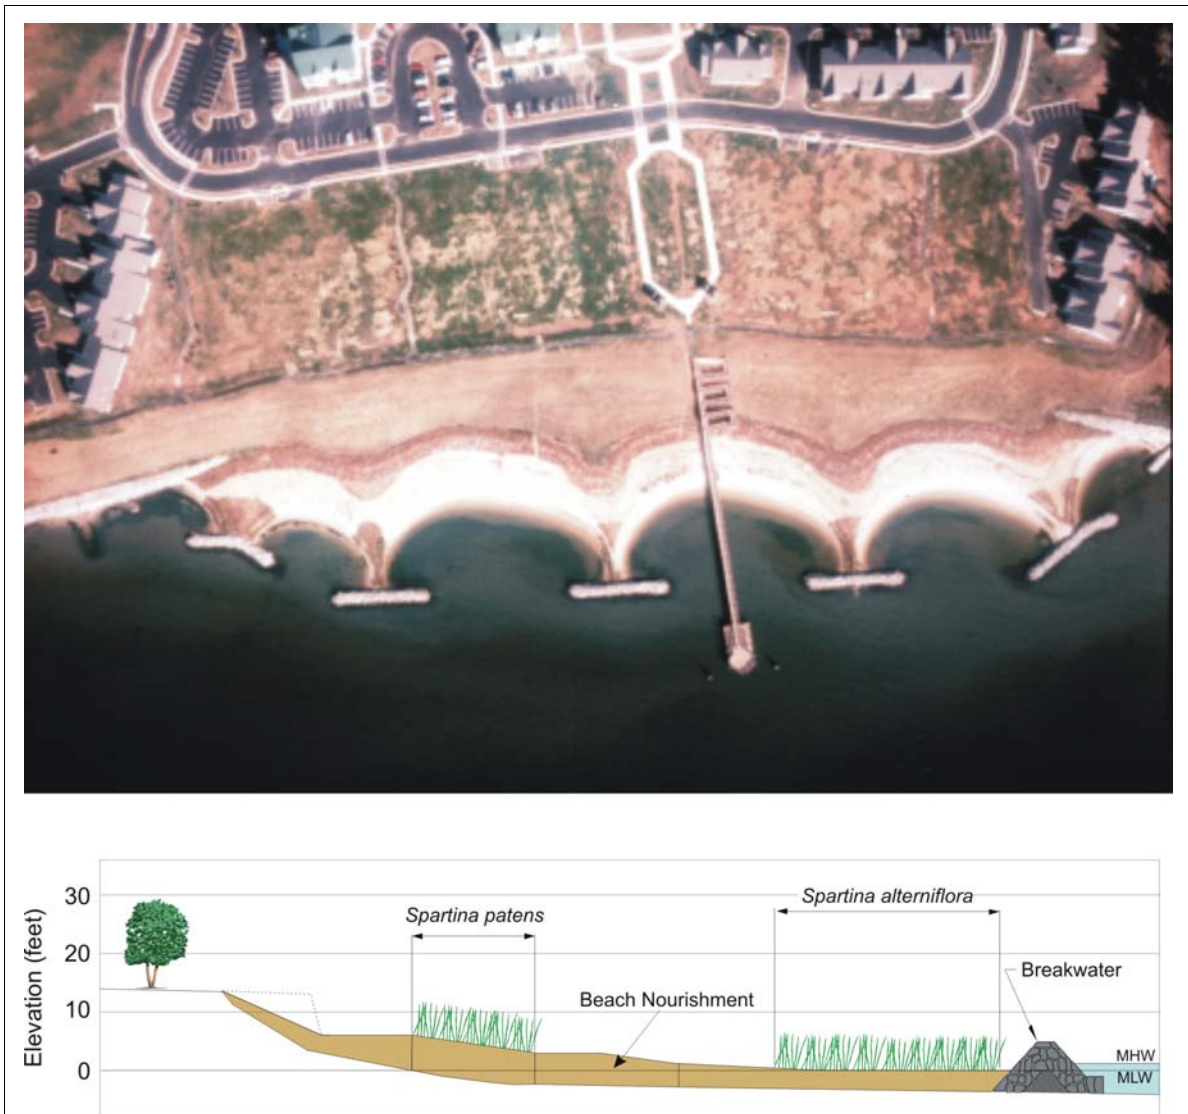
Breakwater system on Patuxent River in Calvert County, MD, and a typical breakwater cross section
